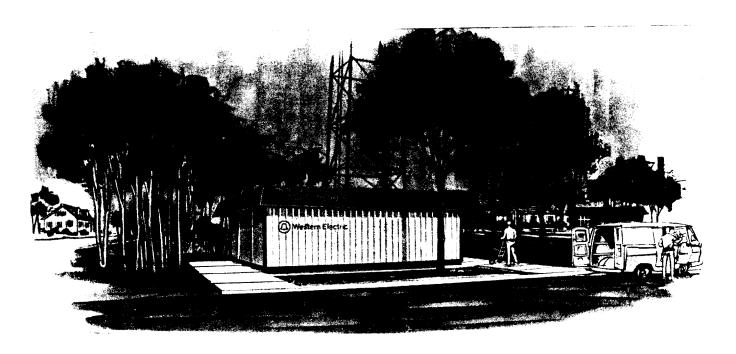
Sample Design Styles for Equipment Buildings in Urban Locations
